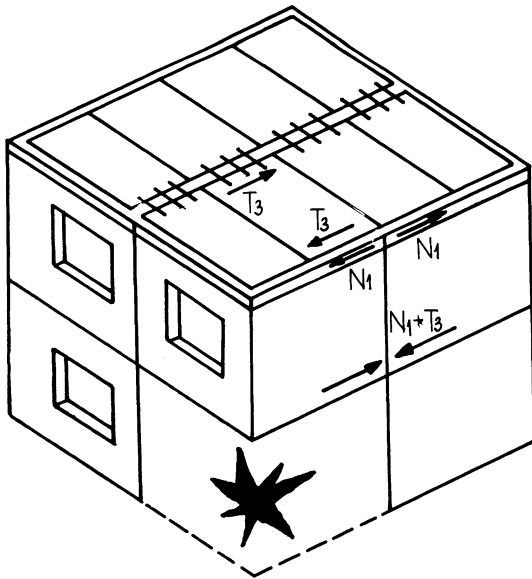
Floor-tie beam interaction in developing the secondary stability system
